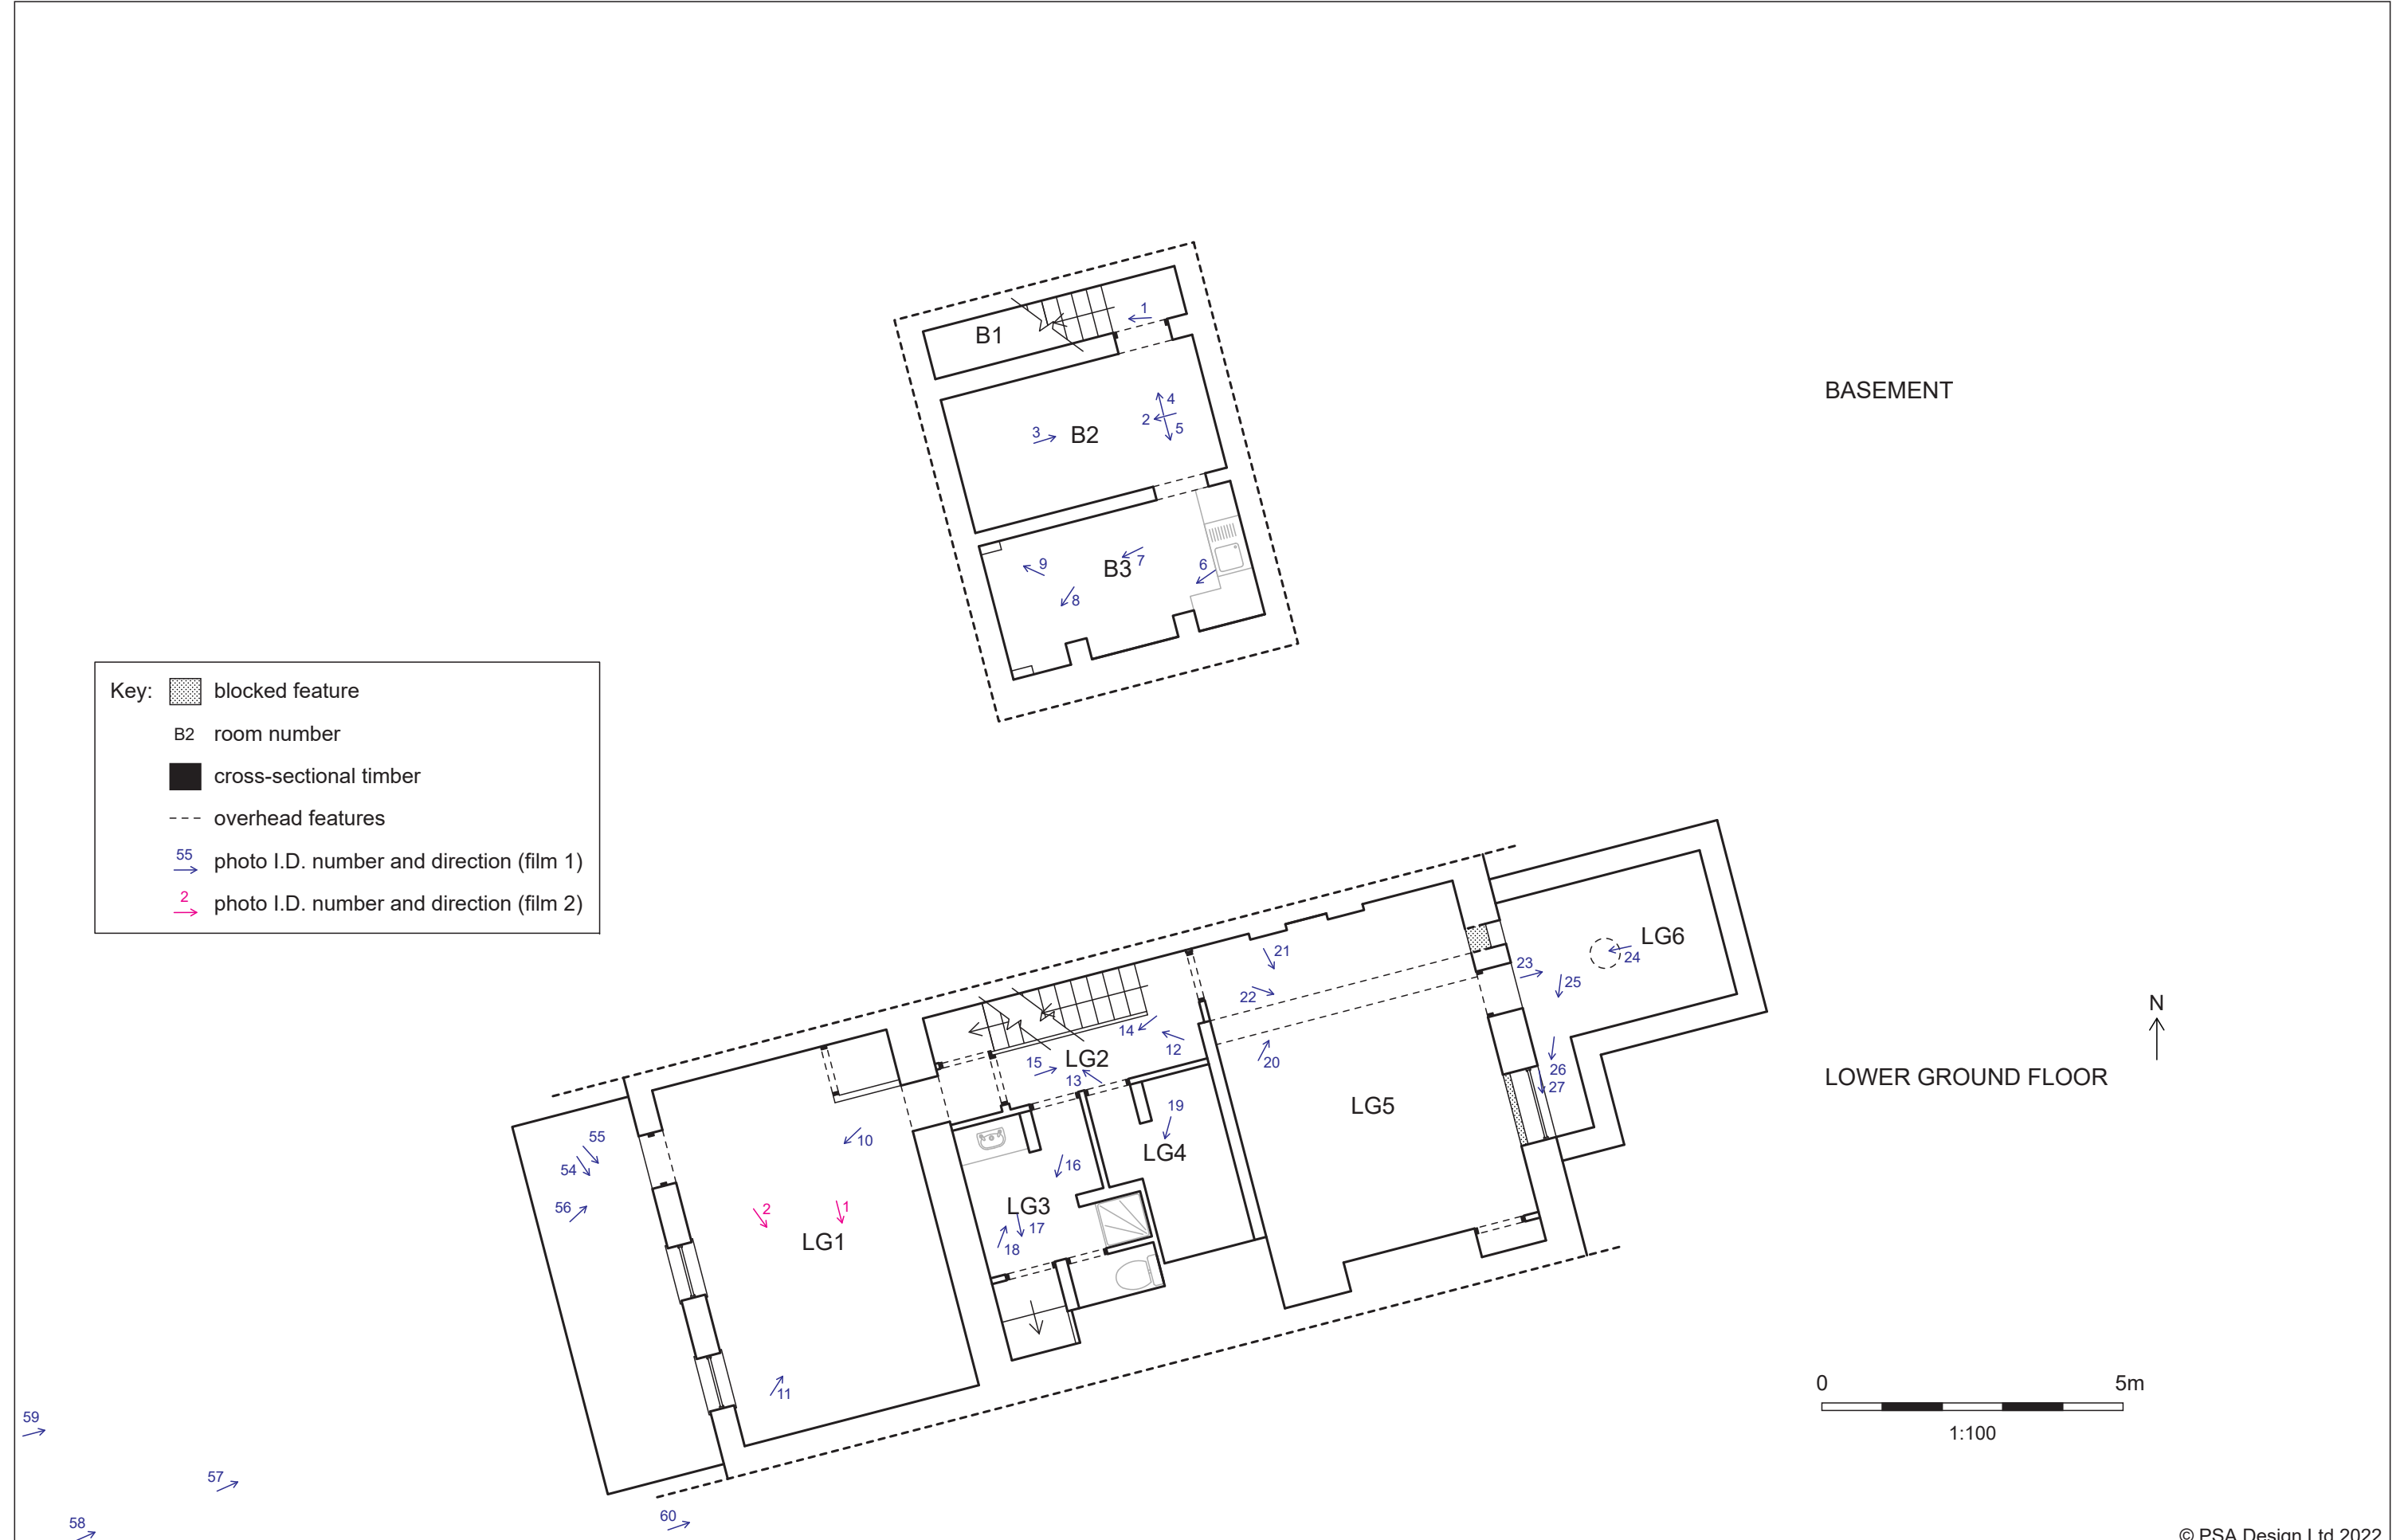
Basement and lower ground floor plans, showing the location and direction of photographs taken
